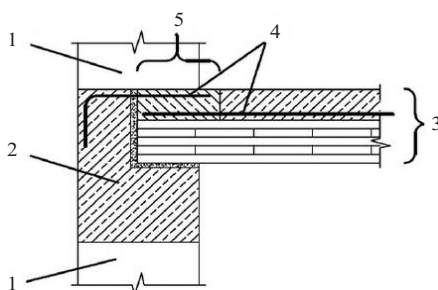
HoHo Vienna Tower – principle of hybrid structures: 1 – wooden pillars; 2 – reinforced concrete girder; 3 – composite wood-reinforced concrete slab; 4 – composite reinforcement; 5 – over concrete (perimeter strip)
